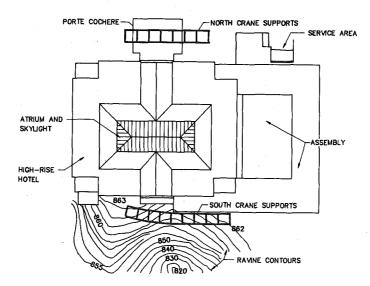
Site Plan Showing Building, Cranes, and South Ravine
